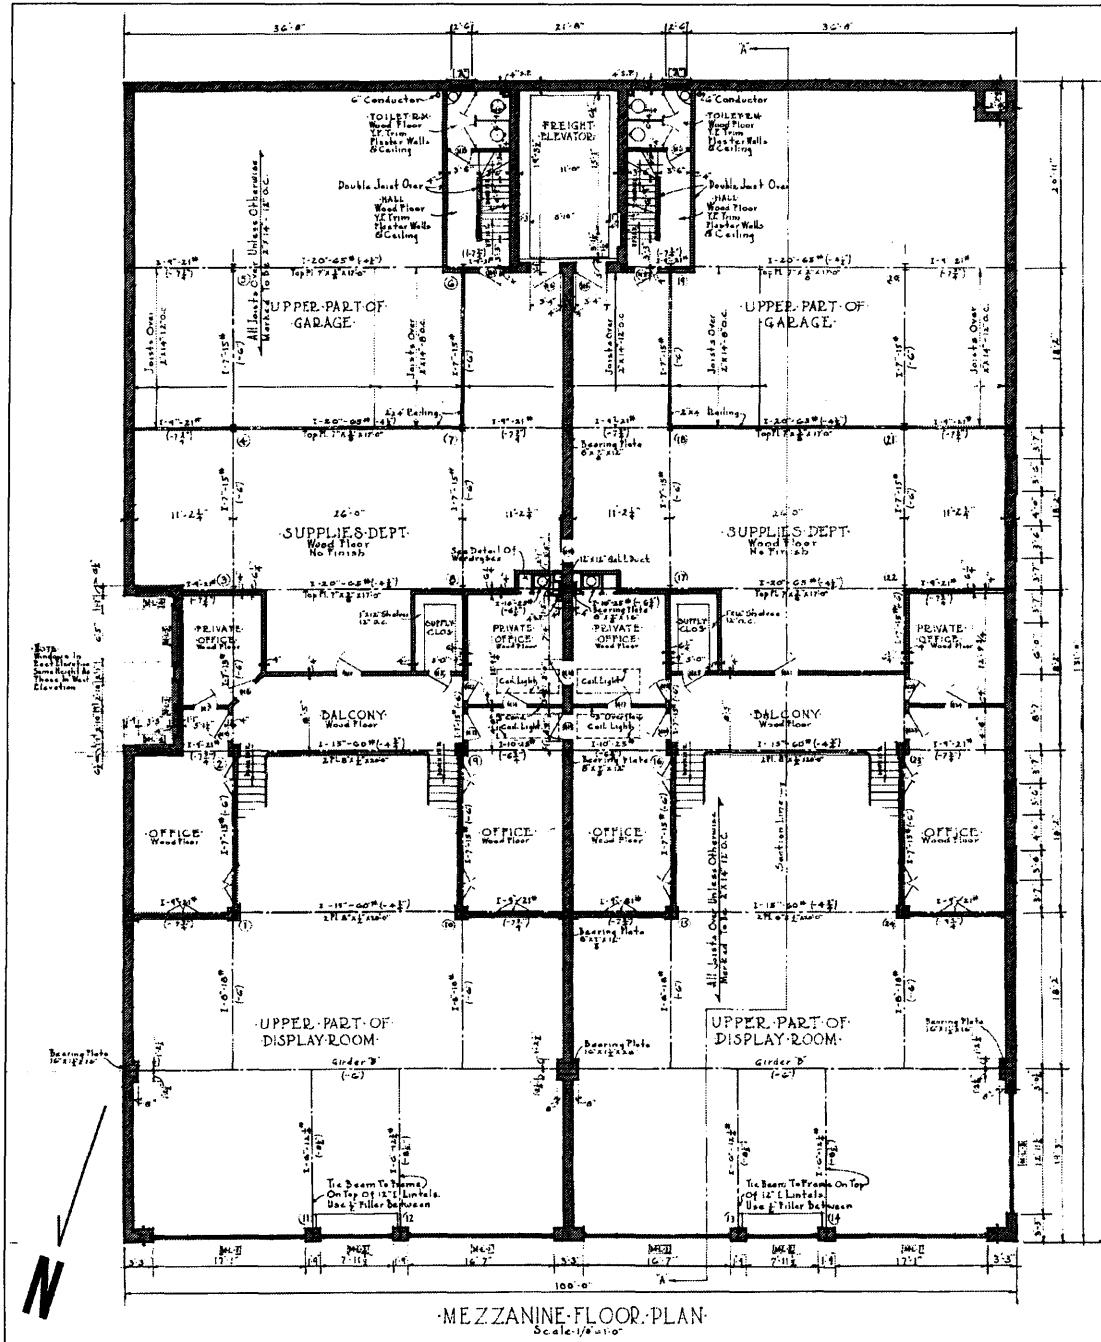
Historic mezzanine floor plan (Proudfoot, Bird & Rawson, architects, 1916)
